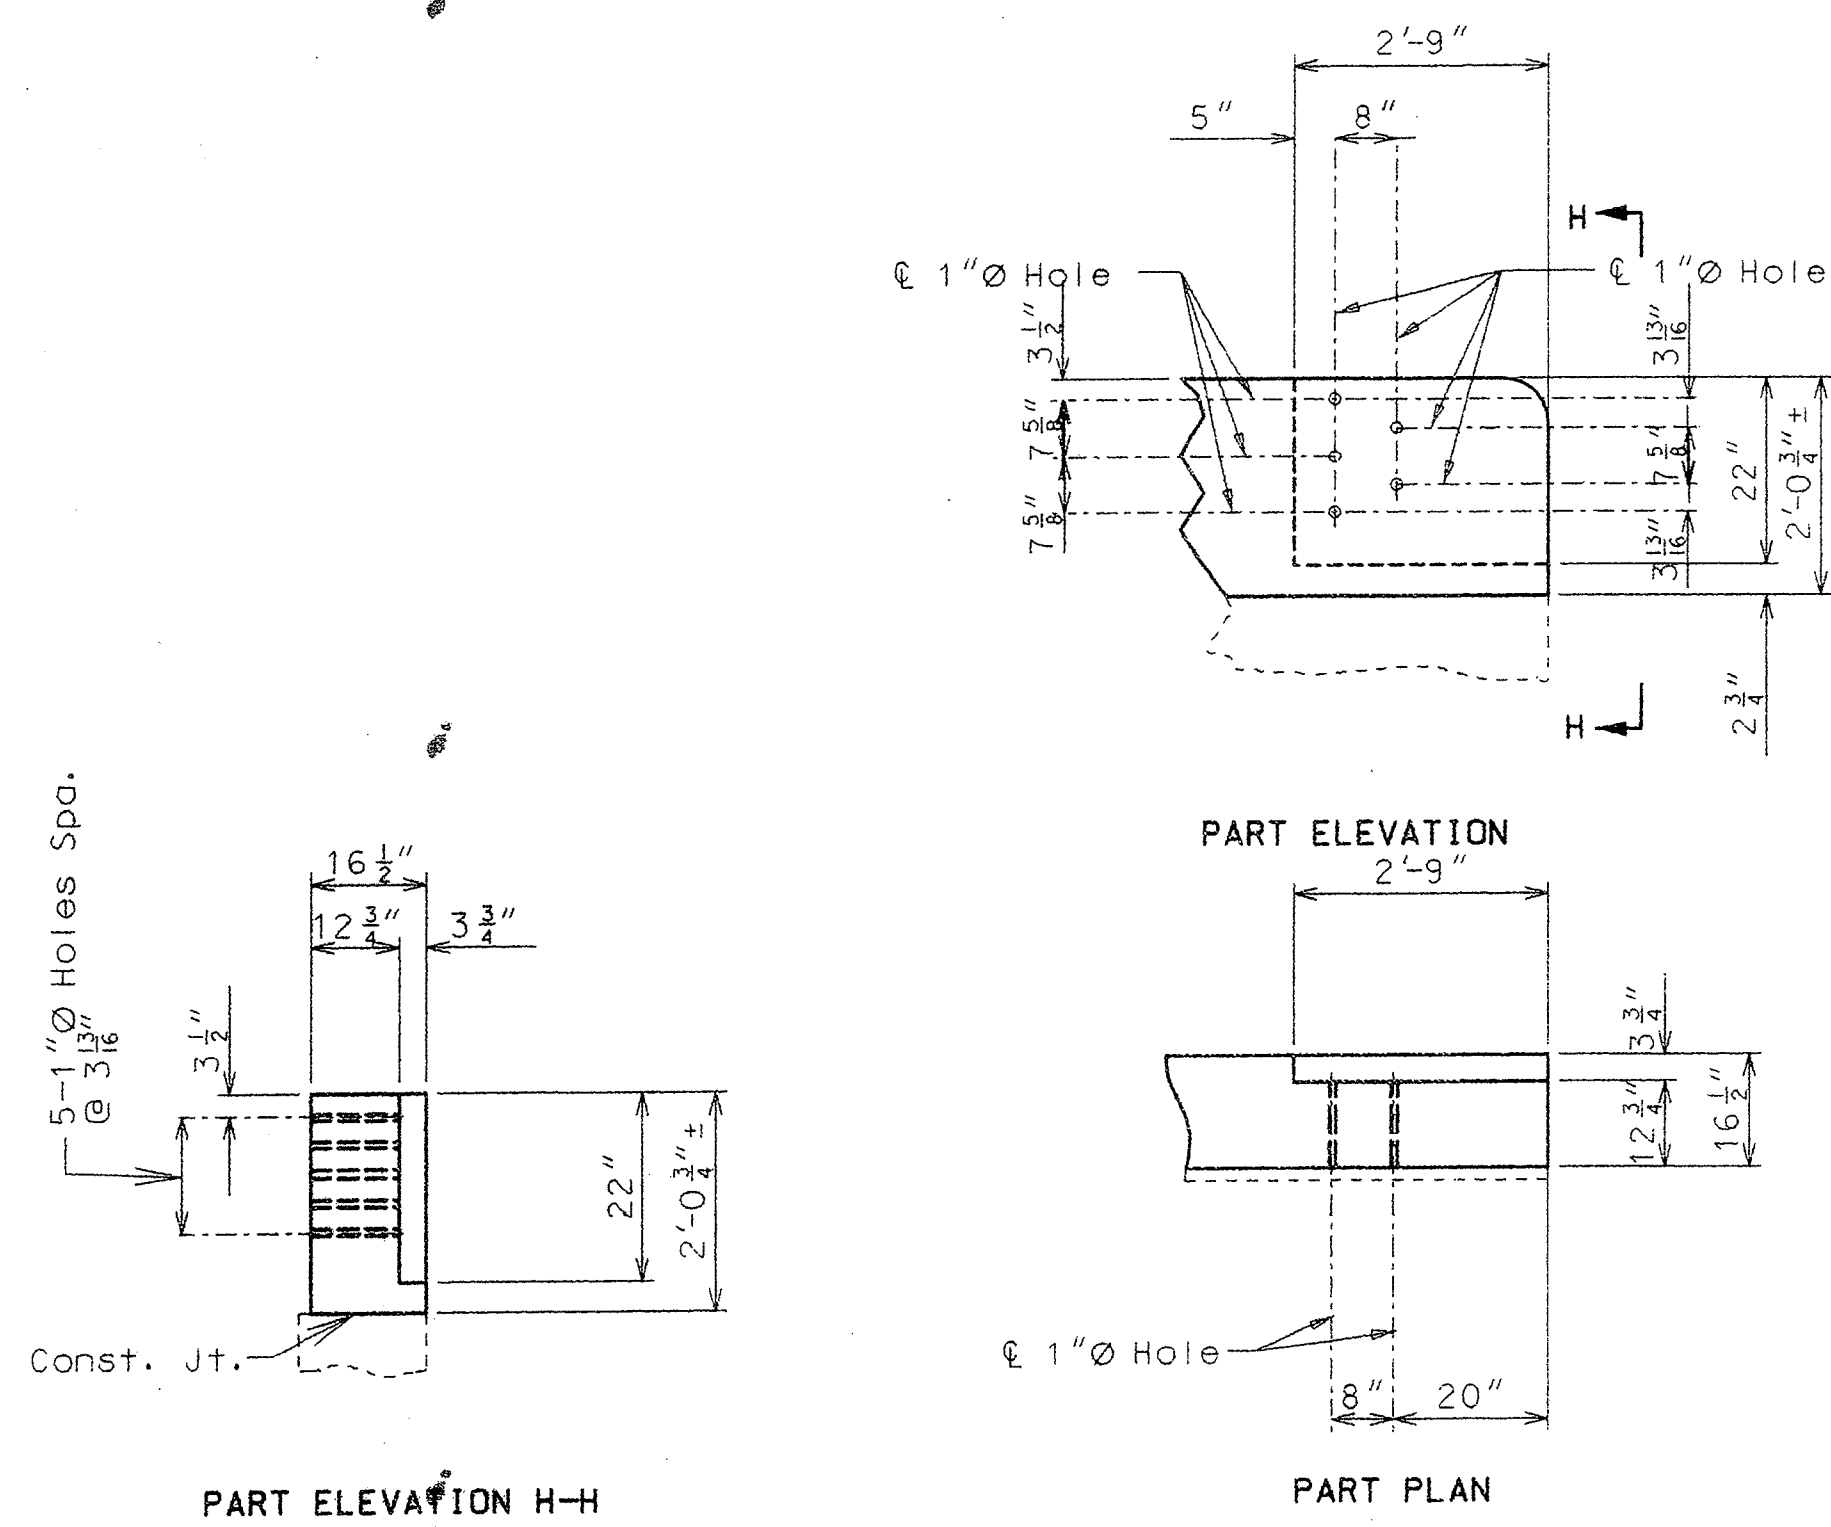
DETAILS OF BLOCKOUT ON WING AT END BENT NO. 1
